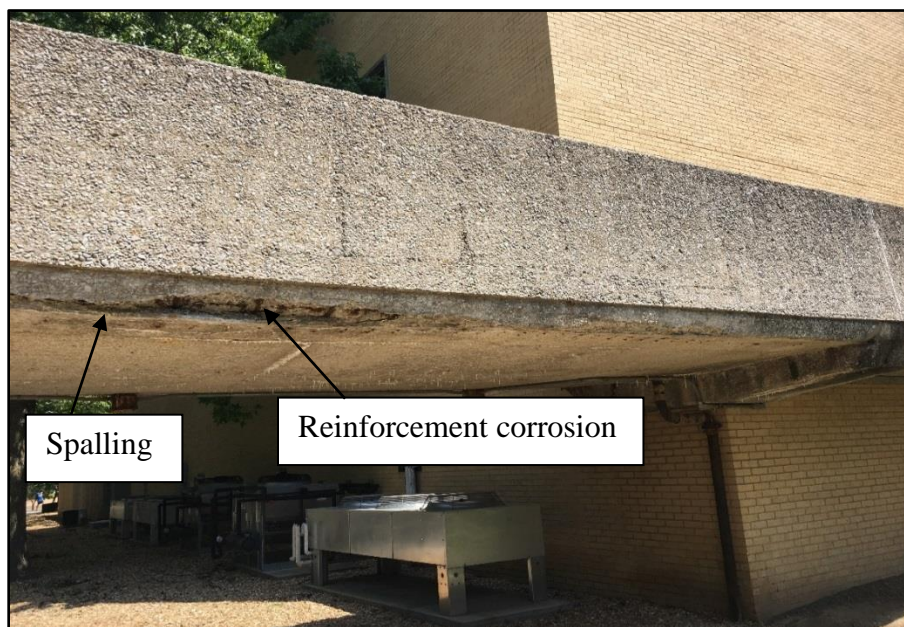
Spalling and reinforcement corrosion at the bottom surface of the bridge deck.
